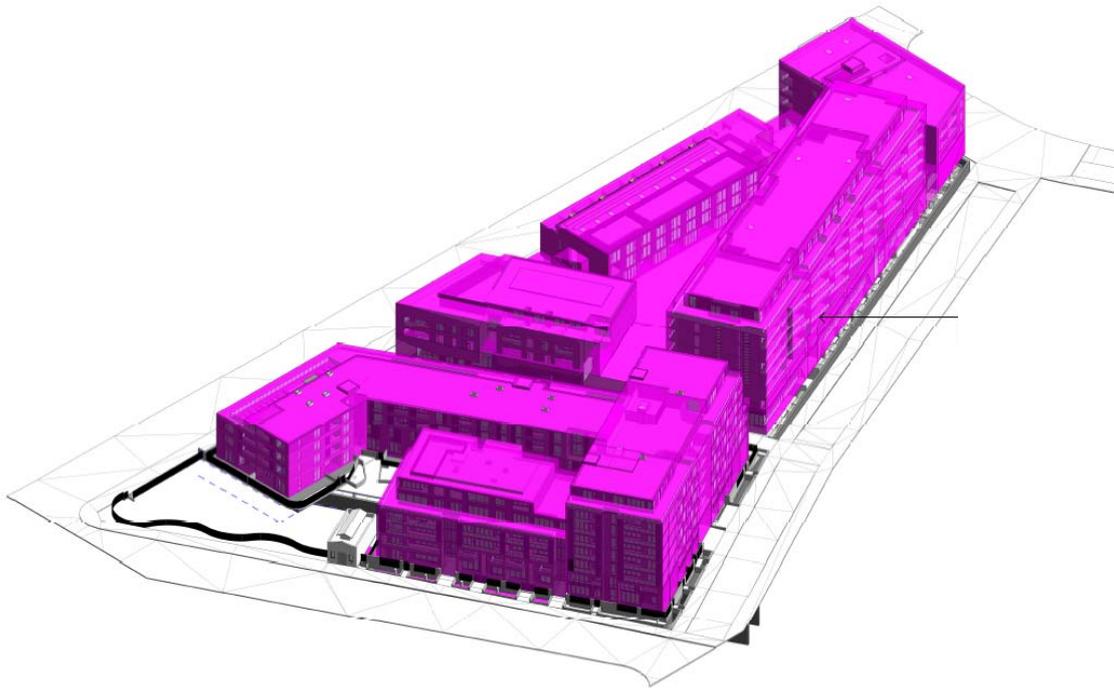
Axonometric drawing of the detailed design proposed for Blocks B and C within the amended building envelope, as viewed from an elevated position to the south-east
